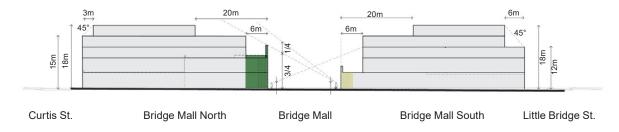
Existing built form section for Sub-Area 2: Bridge Mall Central - Section D
